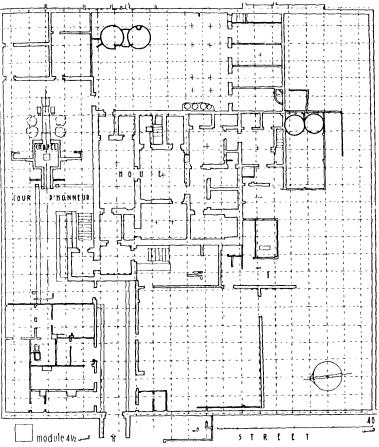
Plan of the villa of the architect Hatiay showing the modular system based upon the layout of the chapel
